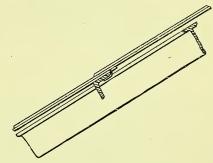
Slates fixed with Iron Wire to Steel Roof.
